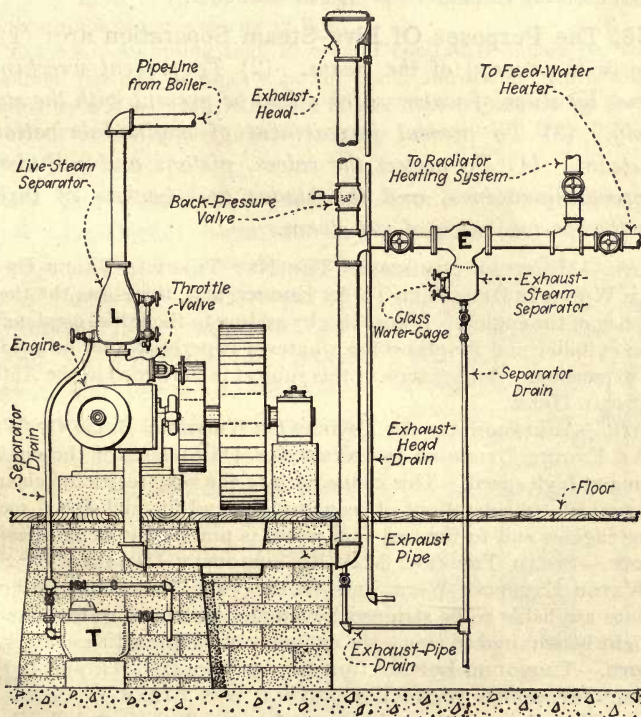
Live-Steam And Exhaust-Steam Separators Installed In Engine Piping.
